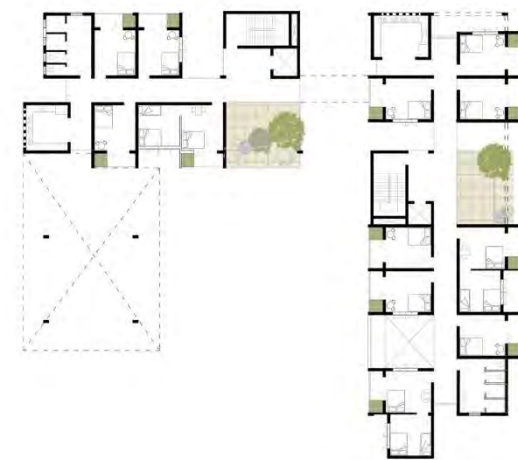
Typical Housing Floor plan. Source: Author
